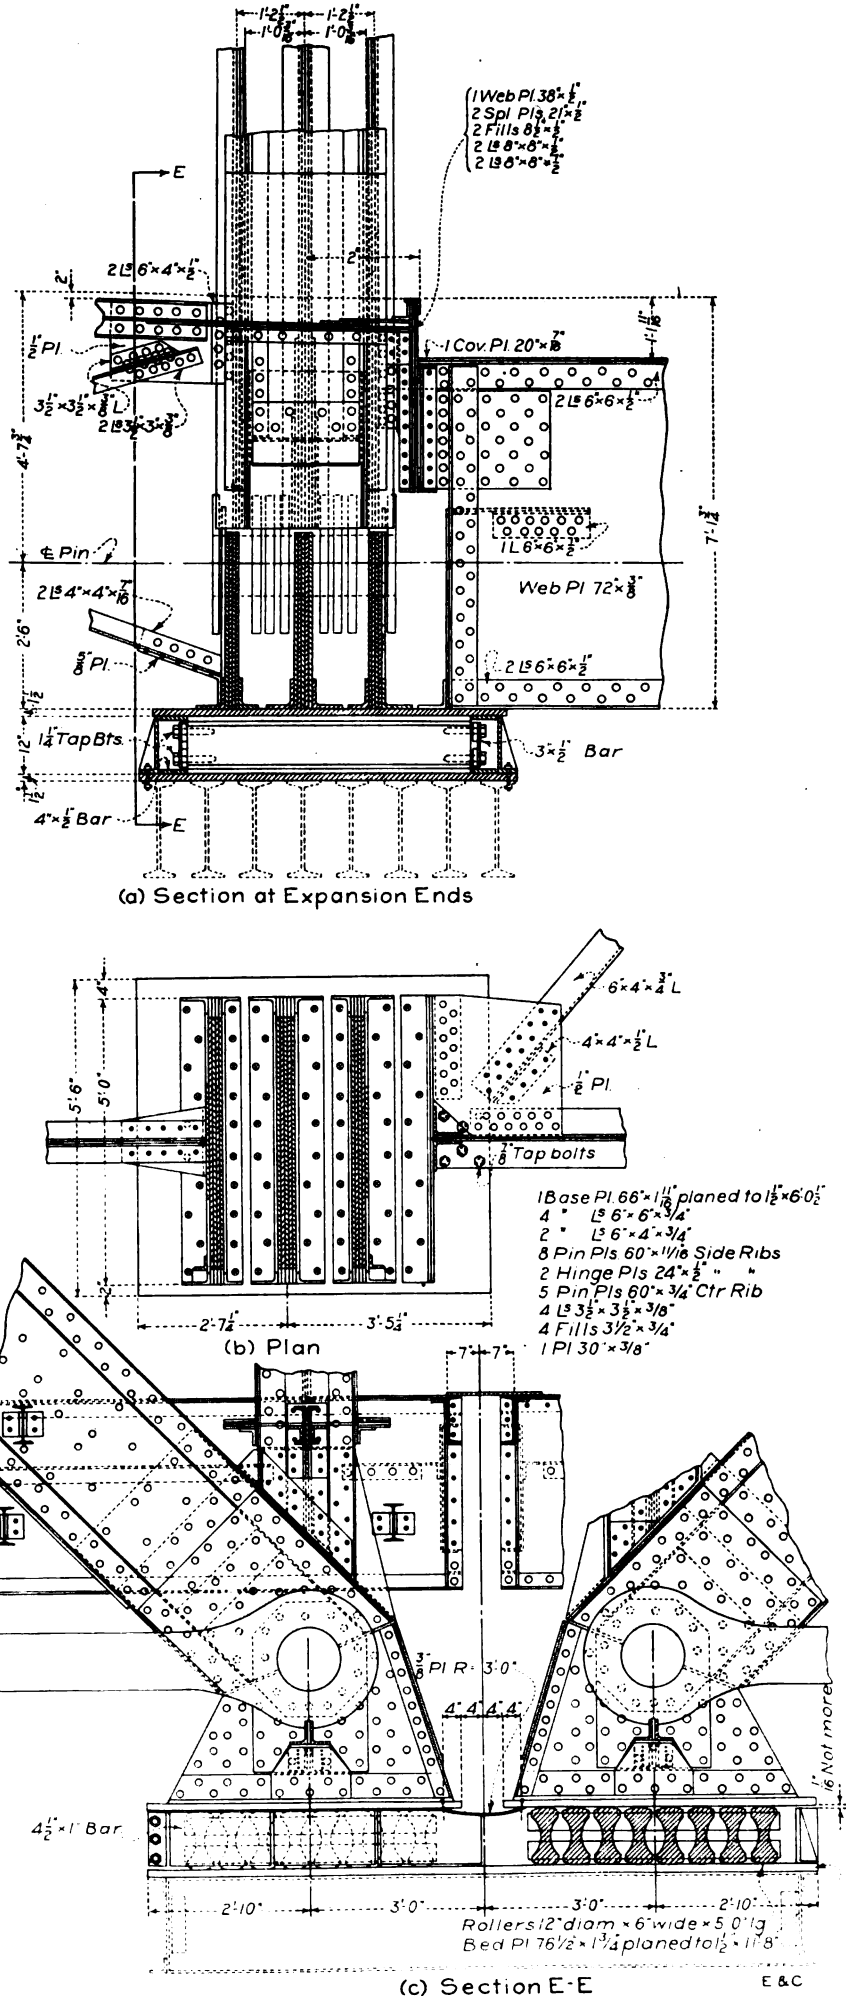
Cross-Section, Plan and Elevation of Expansion End of North Side Point Bridge, Pittsburgh.
